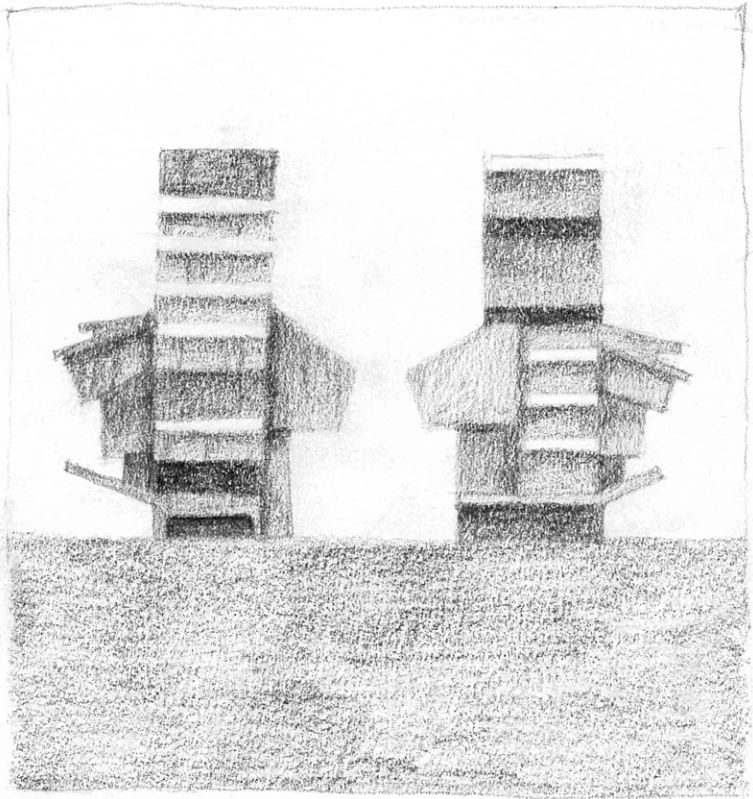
Elevation of door on the eastern facade and window on the western facade at 1:10. Pencil drawing on cartridge, Gothenburg, February 2025.
